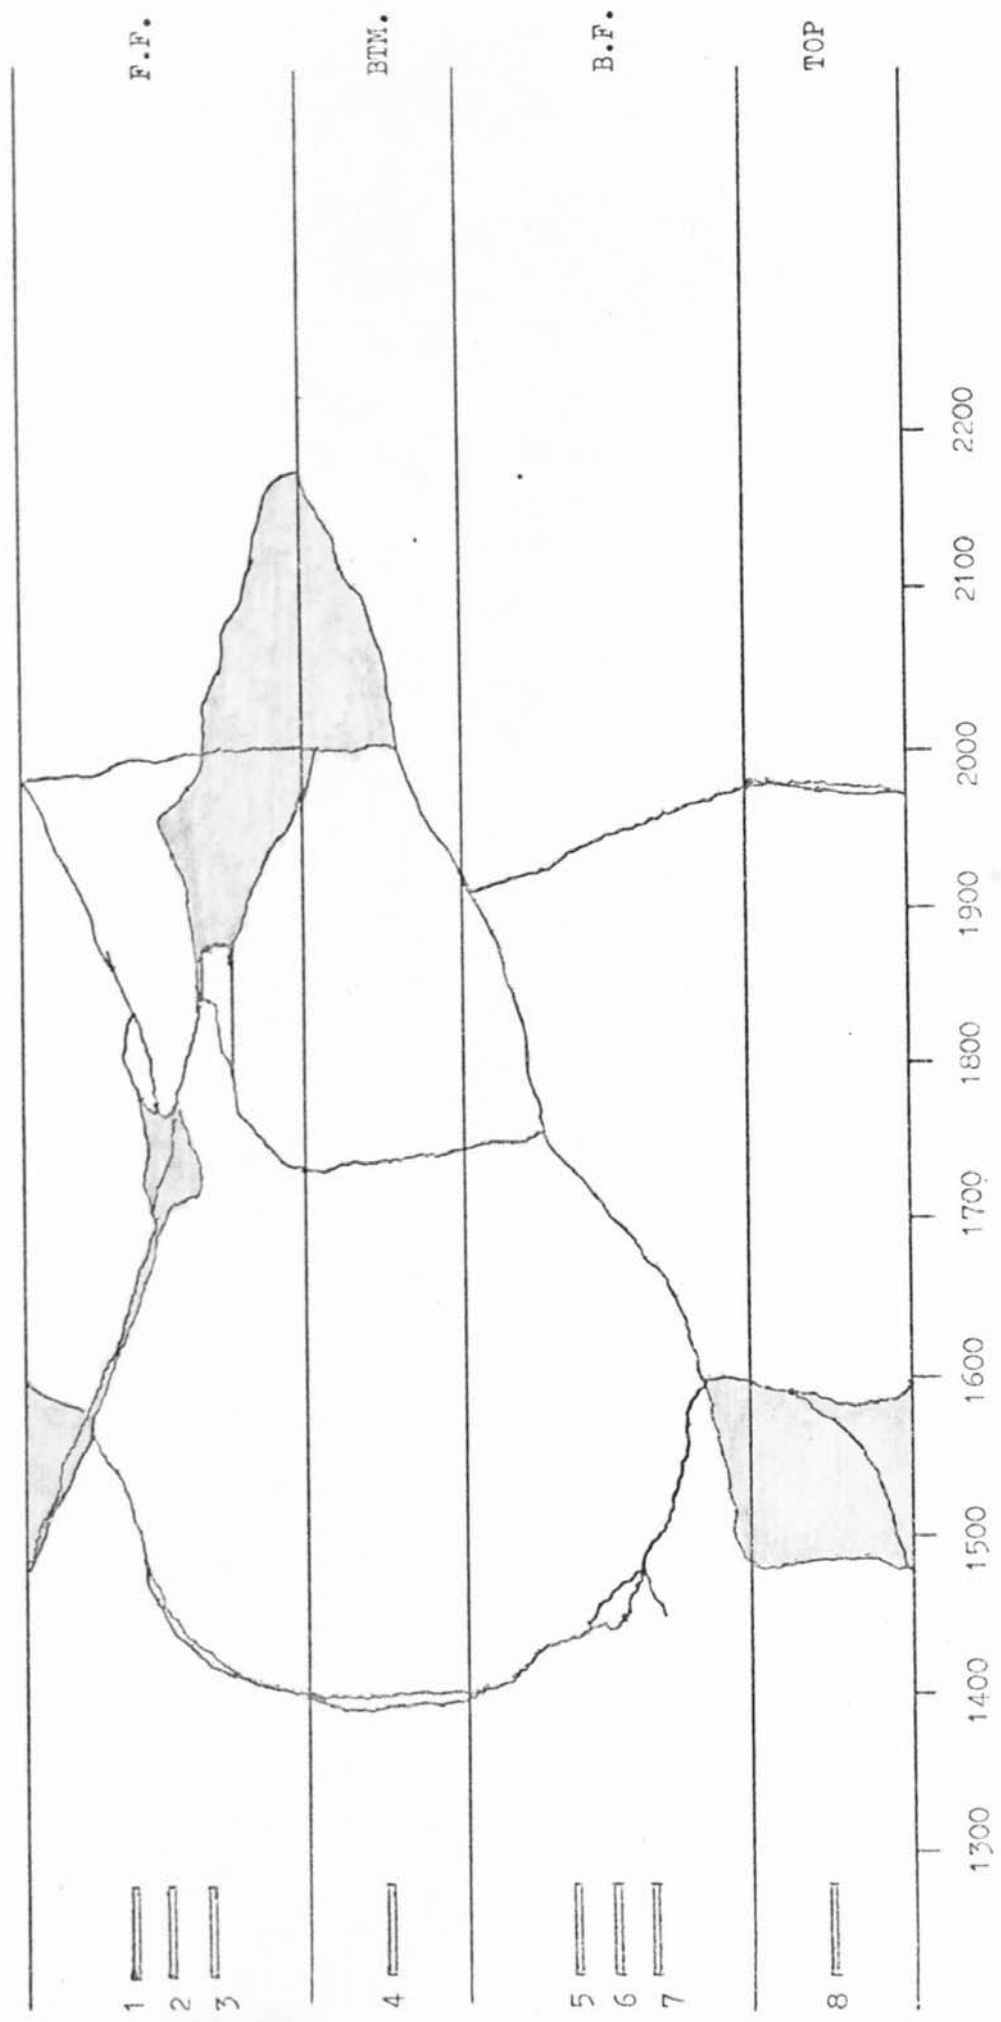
FAILURE CRACK PATTERNS - BEAM 21 (MODE 2)
